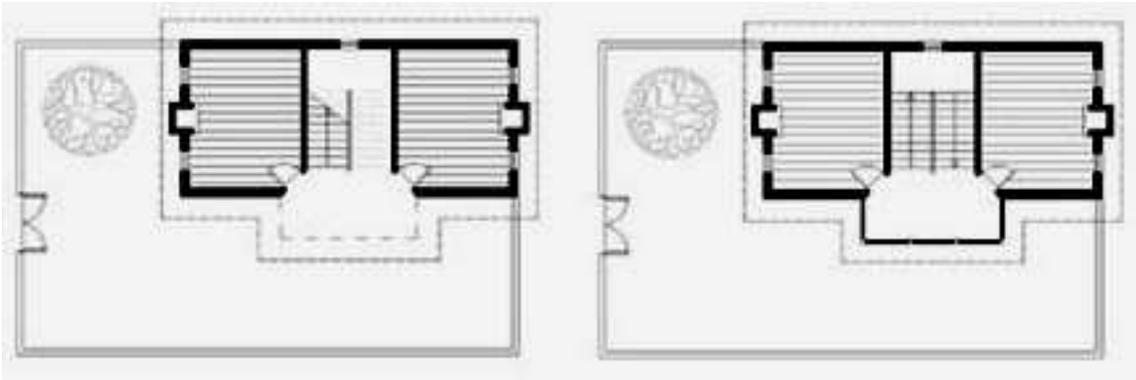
House Type 3c. Ground floor plan (left) and first floor plan (right) (Drawings by author)
